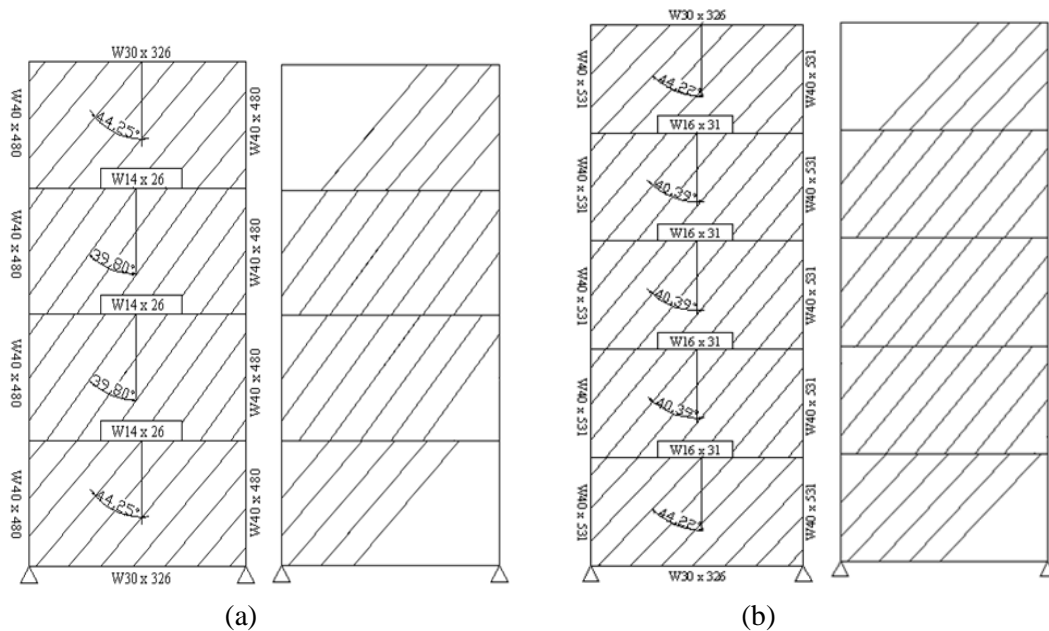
Planar SPSWs strip models (left) and yielded strips (right): (a) 4-story strip model, (b) 5-story strip model
